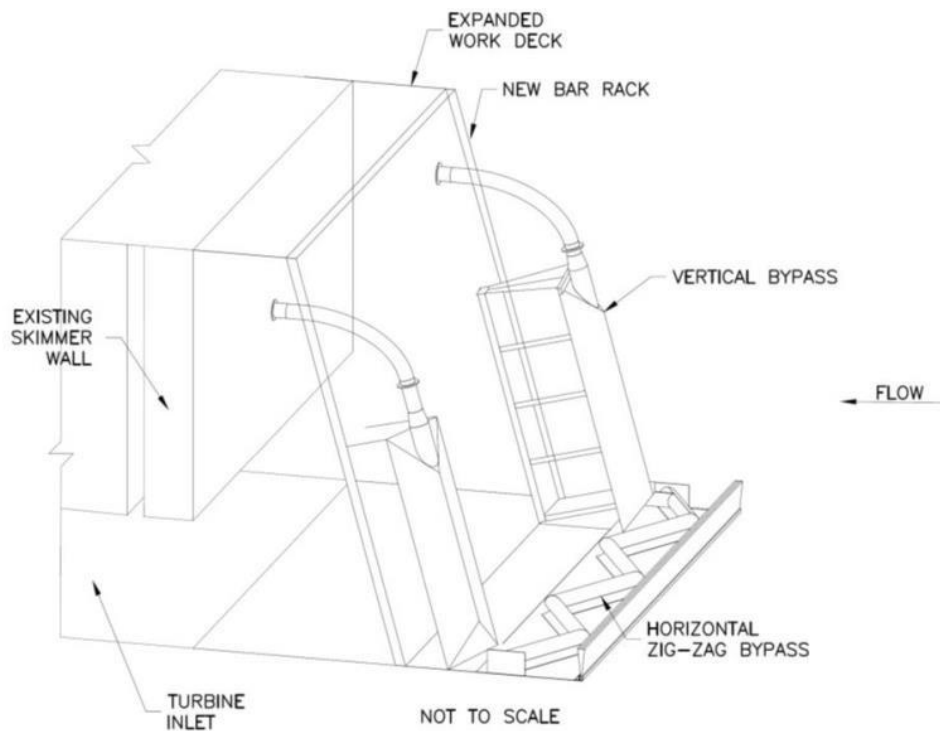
Conceptual design of vertical and horizontal bypasses installed at Pepperell (isometric view).
